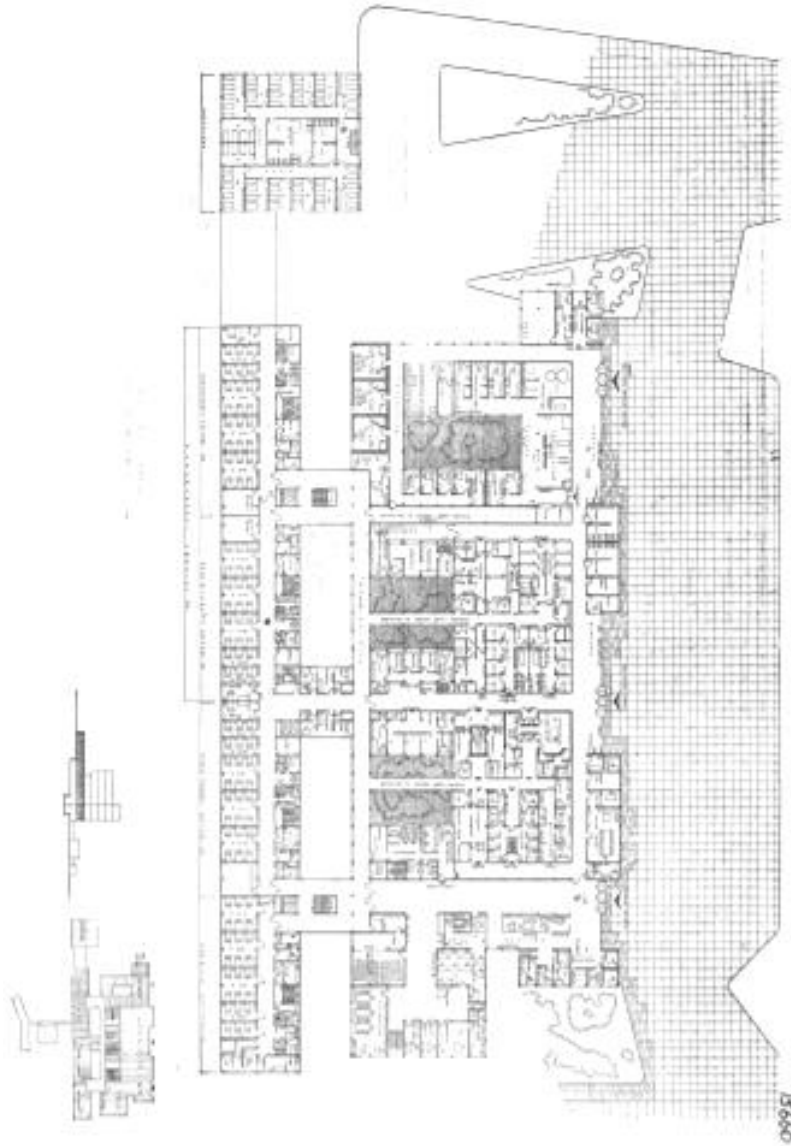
Ground Floor Plan, Vakıf Guraba Hospital
